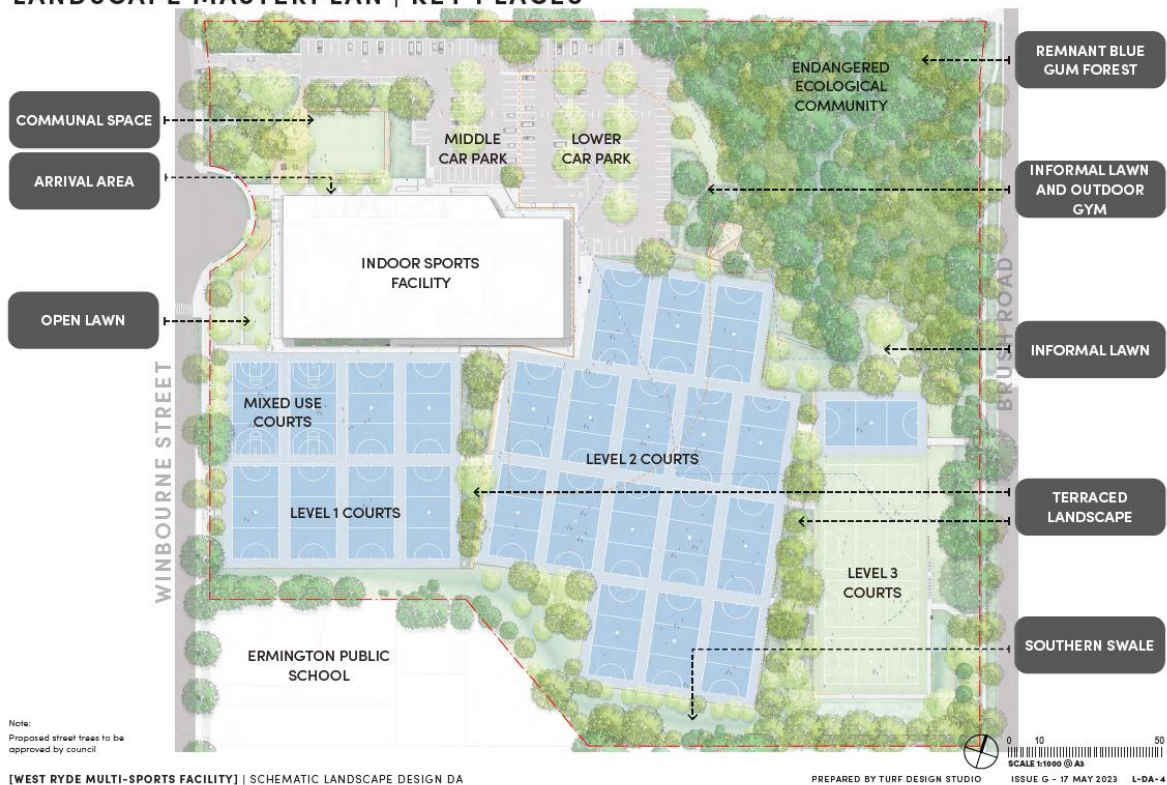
Extract from the Schematic Landscape Design plans showing the *Key Places* which comprise the landscape masterplan.
